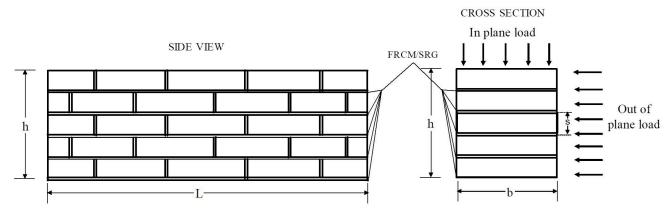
FRCM/SRG reinforced masonry crowning-beam: geometrical properties and load patterns.
